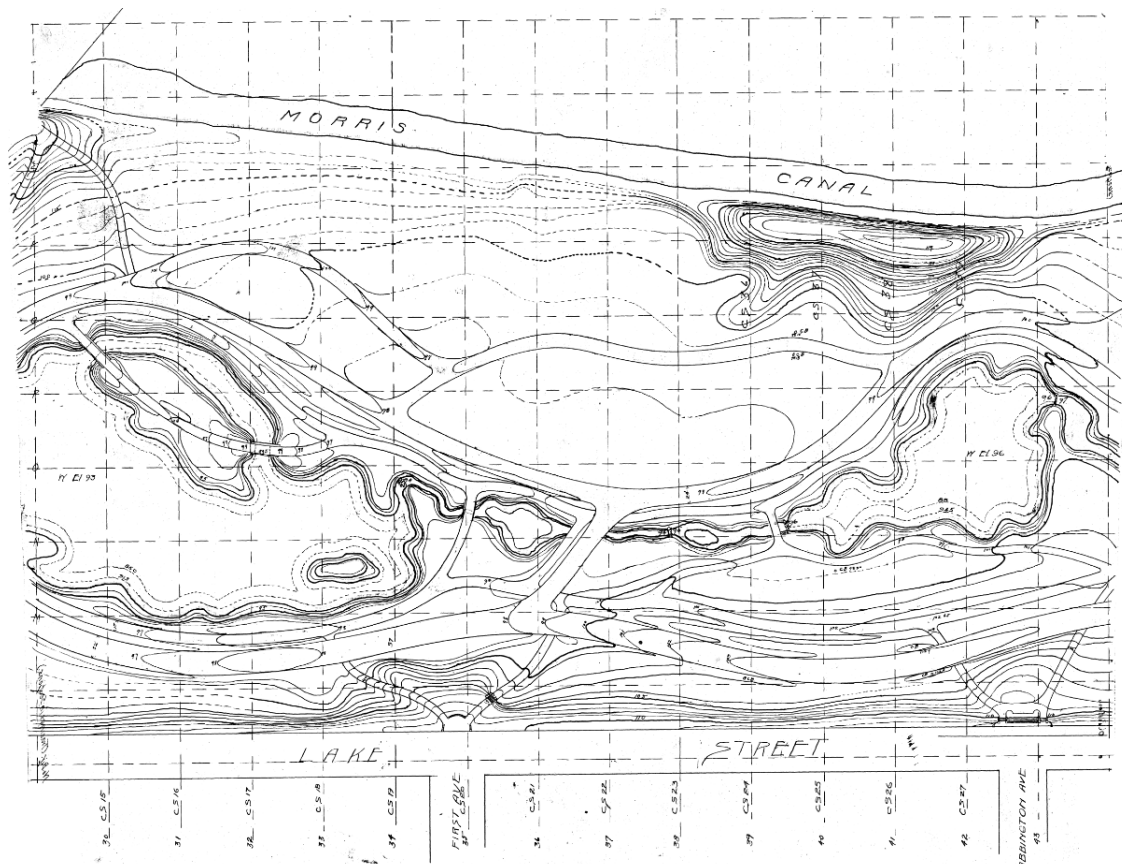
Branch Brook Park: Northern Division Grading Plan. Image Credit: Archives of the Essex County Park System.
